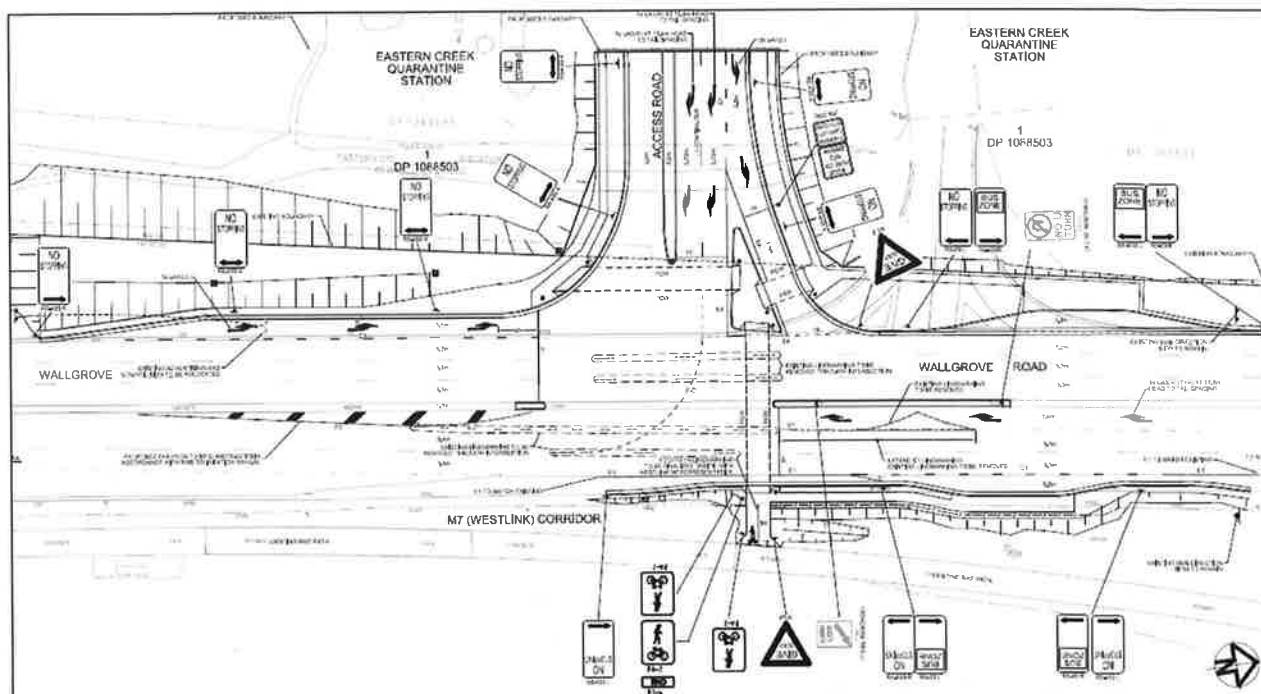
Signalised Site Access/Wallgrove Road Intersection Design Arrangement
